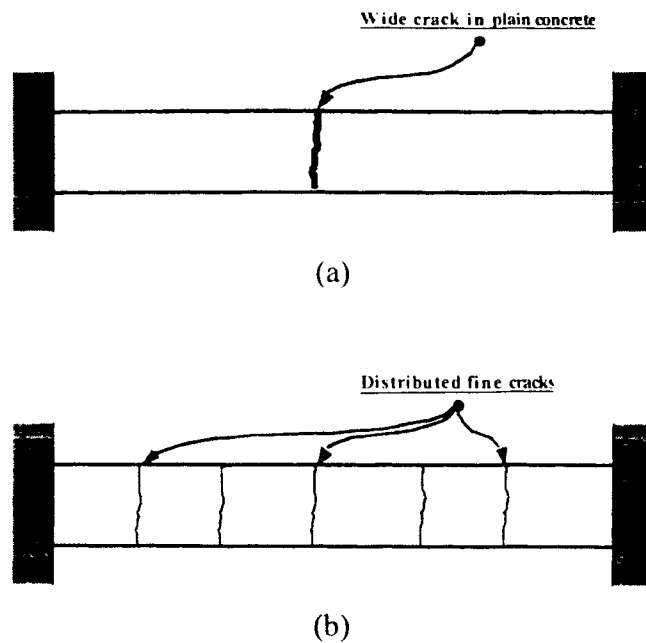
Crack formation due to volumetric deformation in a fully restrained beam, (a) crack formation in a plain concrete beam (single wide crack), (b) crack formation in a reinforced concrete beam (distributed fine cracks)
